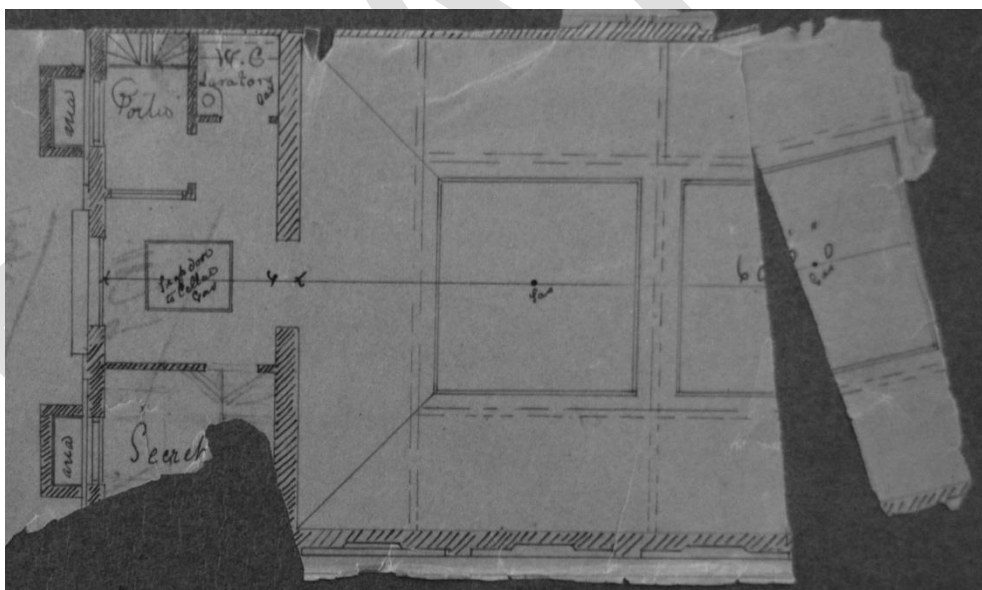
1879. Detail from plans for the new Art Gallery (Suffolk Record Office, drainage plan no. 1323).
